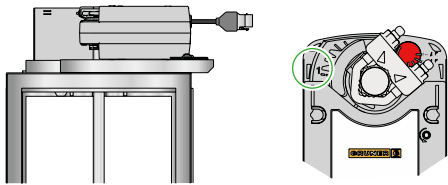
For damper position "Normally closed" the damper should be closed during installation of the spring return actuator. The spindle clamp then sits as shown above.
